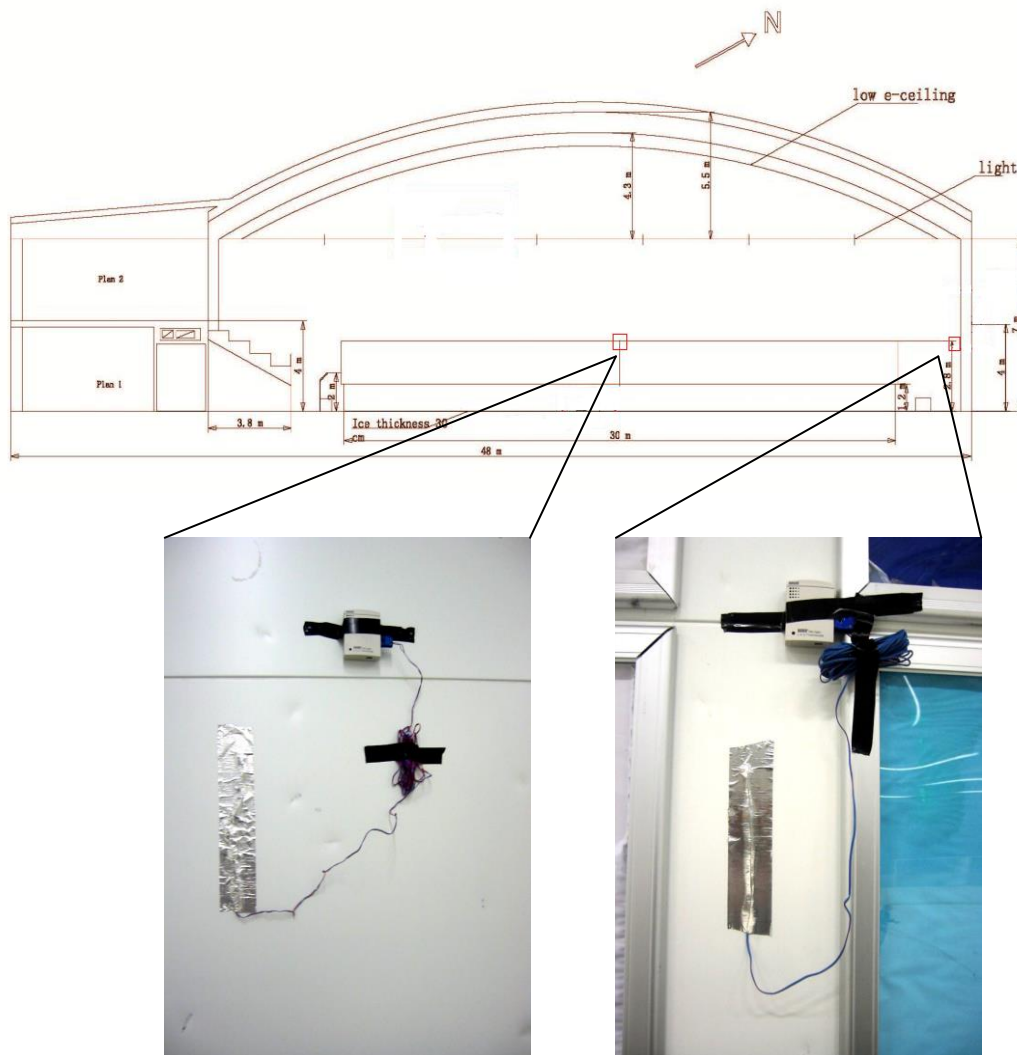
Sensors installed in Älta ice rink, nominated north wall and west wall, respectively.
